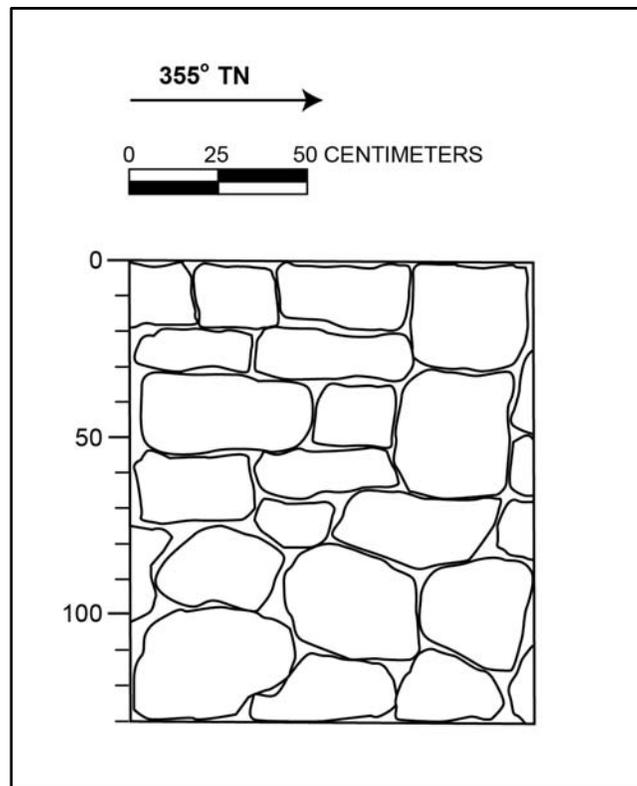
Profile map of a portion of SIHP # -2284, retaining wall
